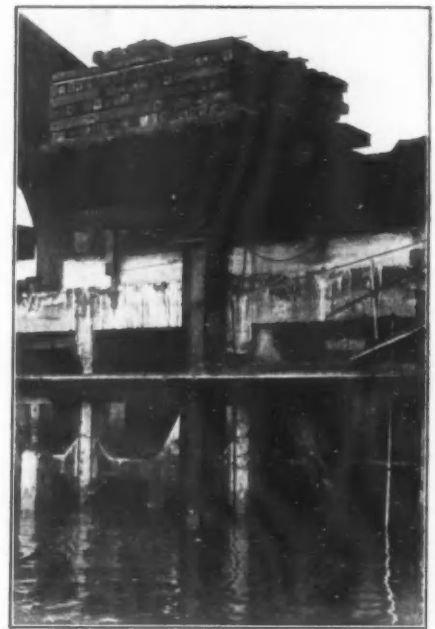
Test loading pile No. 3. Pile extension, 100-ton jack and kentledge.
